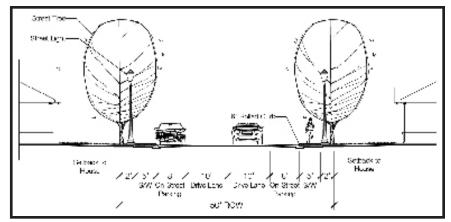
Neighborhood Street - Union Ranch East, Section J
